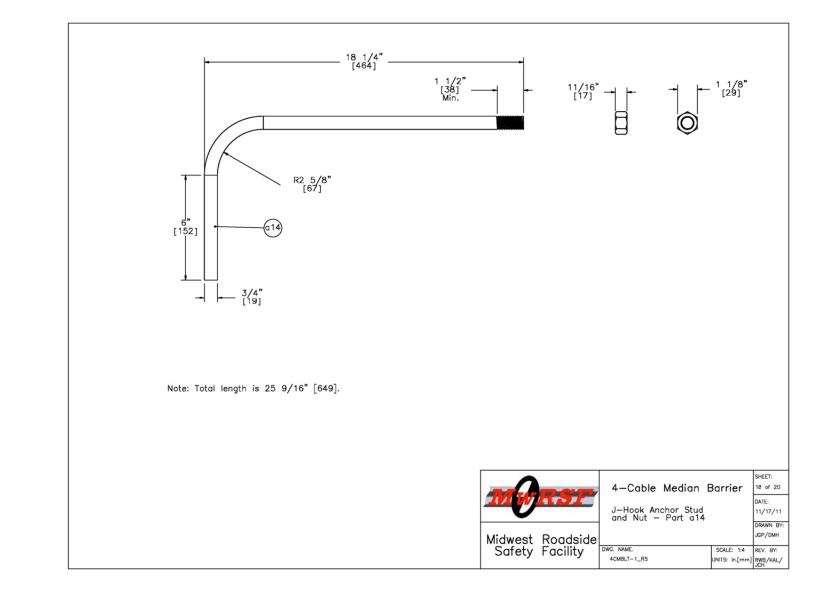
Anchor Stud Detail, Test No. 4CMBLT-1
